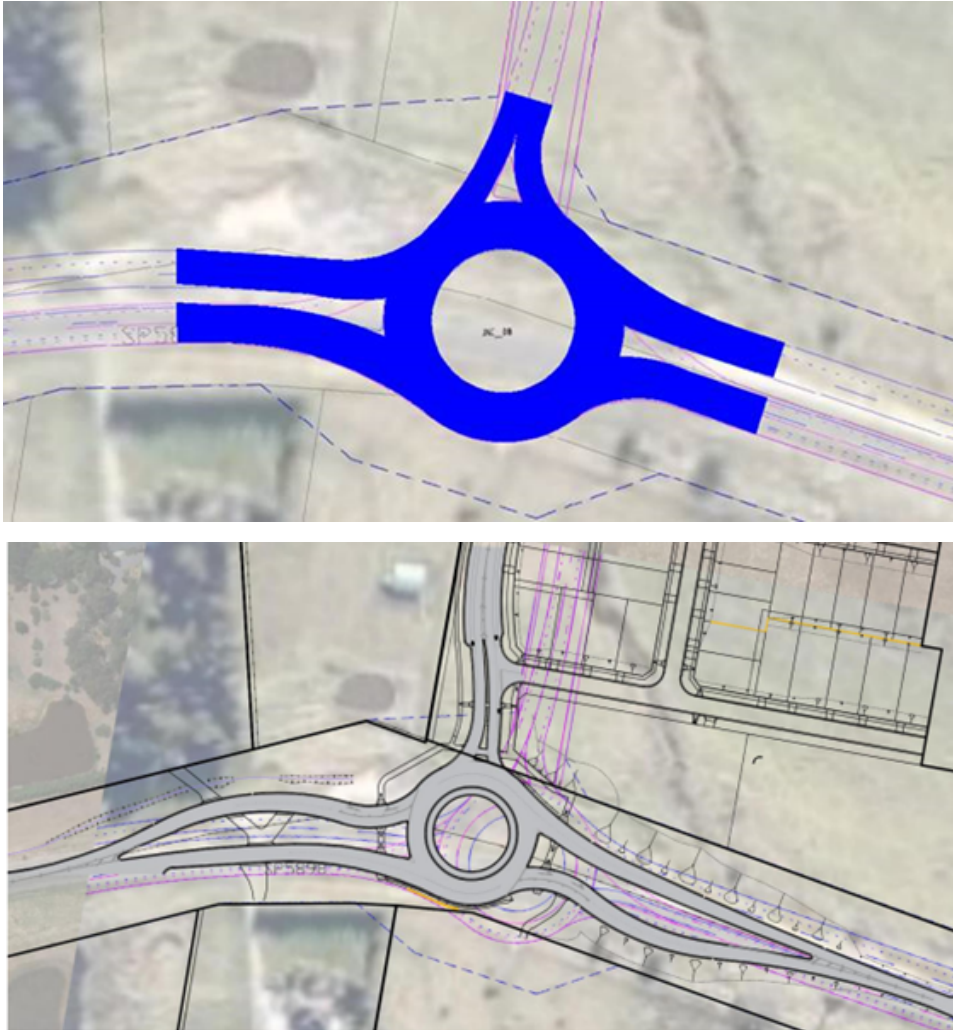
Extent of roundabout pavement required in current DCP (top) compared with the extent of DoT roundabout pavement required and constructed under the planning permit condition (bottom)
